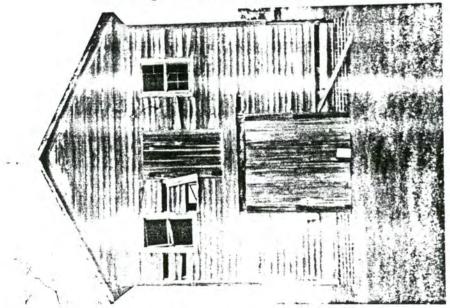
Smithwick-Green House, Packhouse, South Elevation
